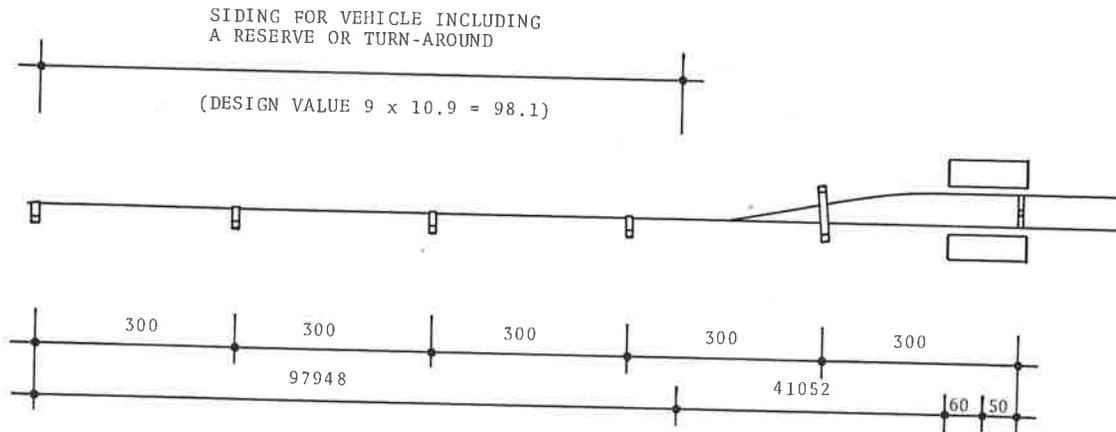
PROPOSED ERLANGEN STORAGE FACILITY
